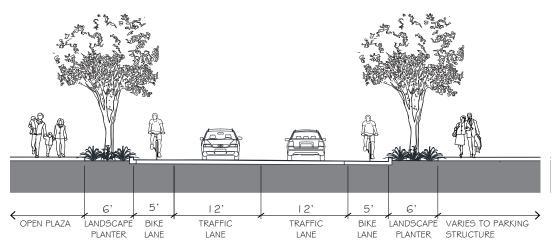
Via Piemonte - North Section (North Entrance) Private Streetscape Section and Plan
